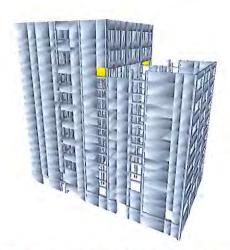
Level 6 strengthening works - infill walls highlighted in yellow
